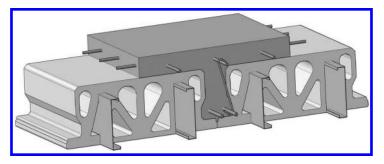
AmDeck ICF concrete floor system. (Courtesy of Amvic Building Systems.)
